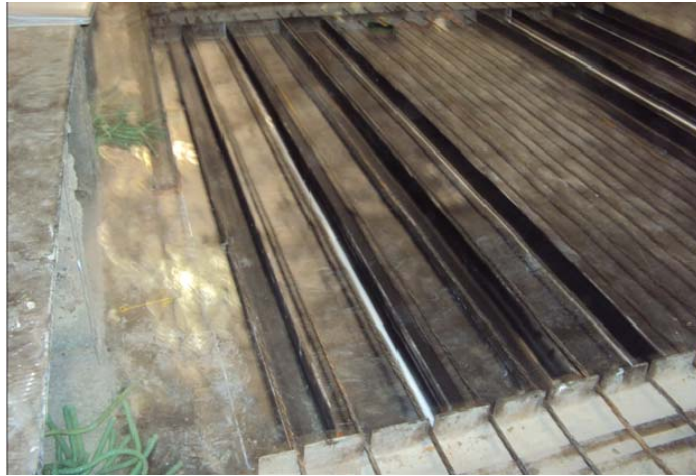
Blockouts Provided to Construct Prestressed Corrosion Specimens
